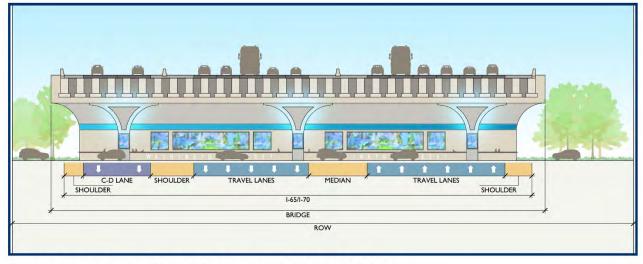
Concept 3 Upgrade Existing Interstates over New York Street
